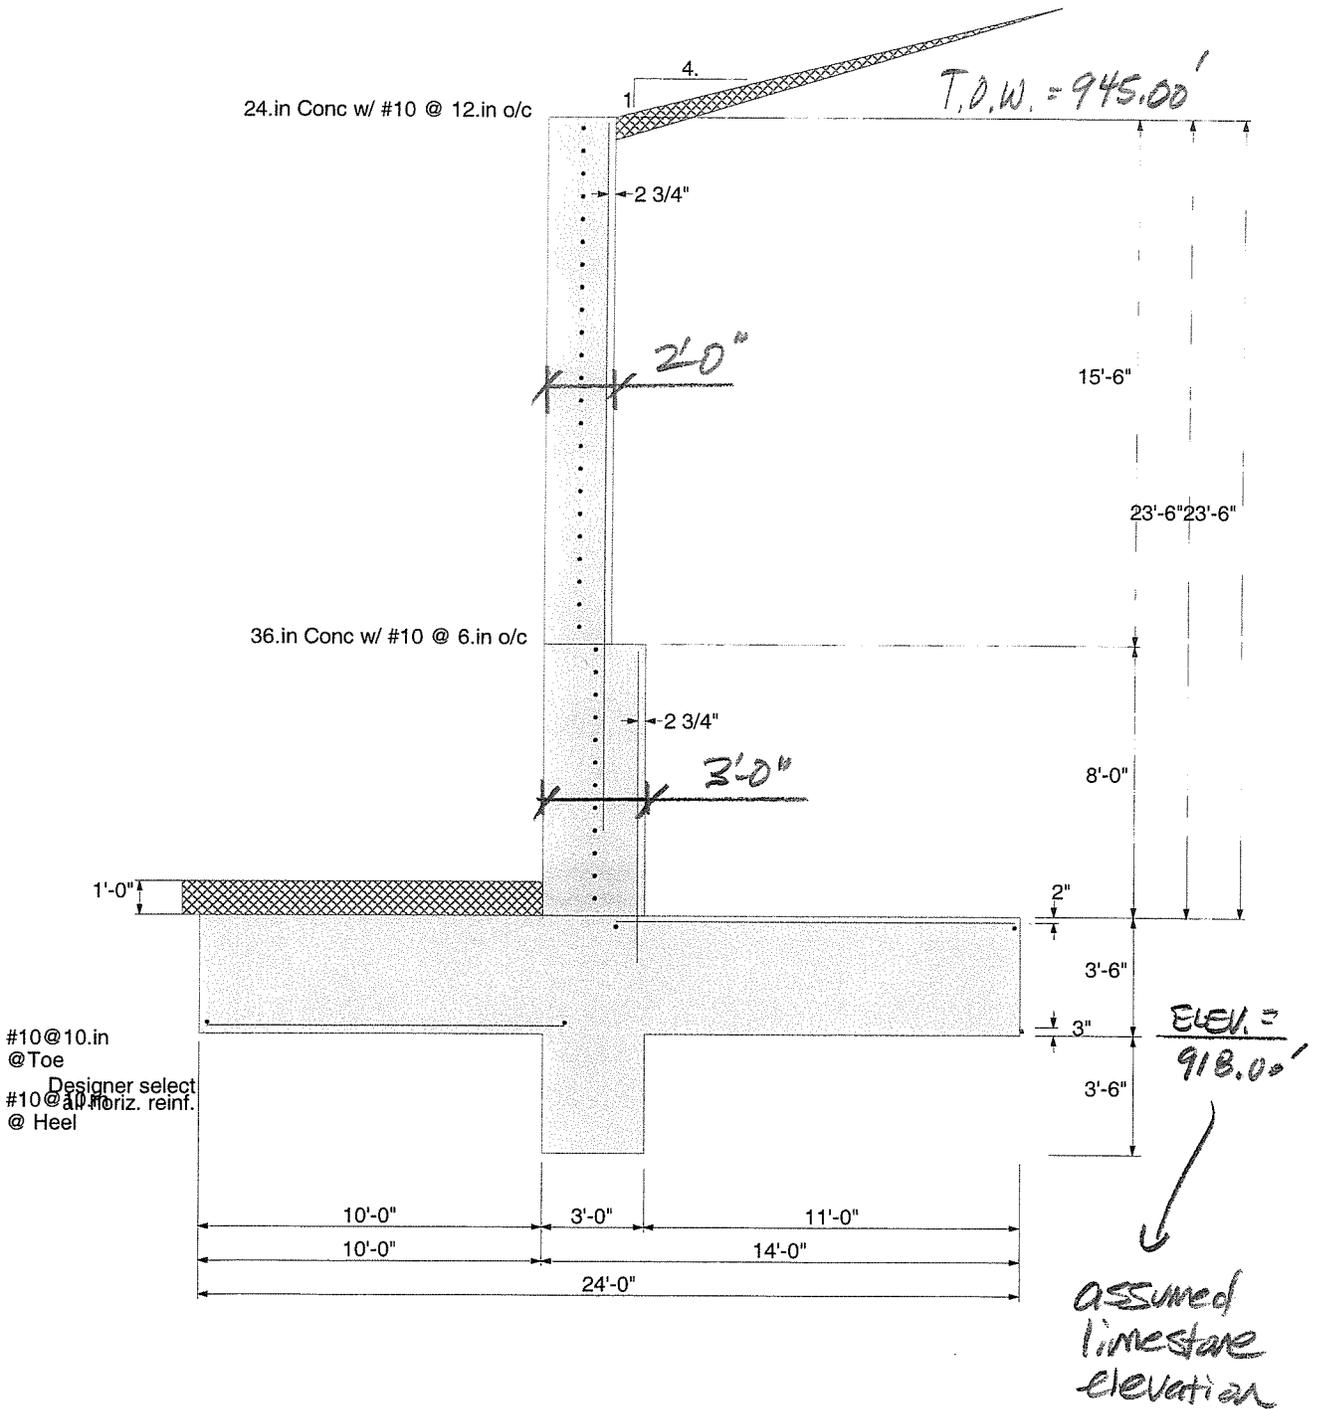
Cross-section view of proposed concrete retaining wall at station 2.403
